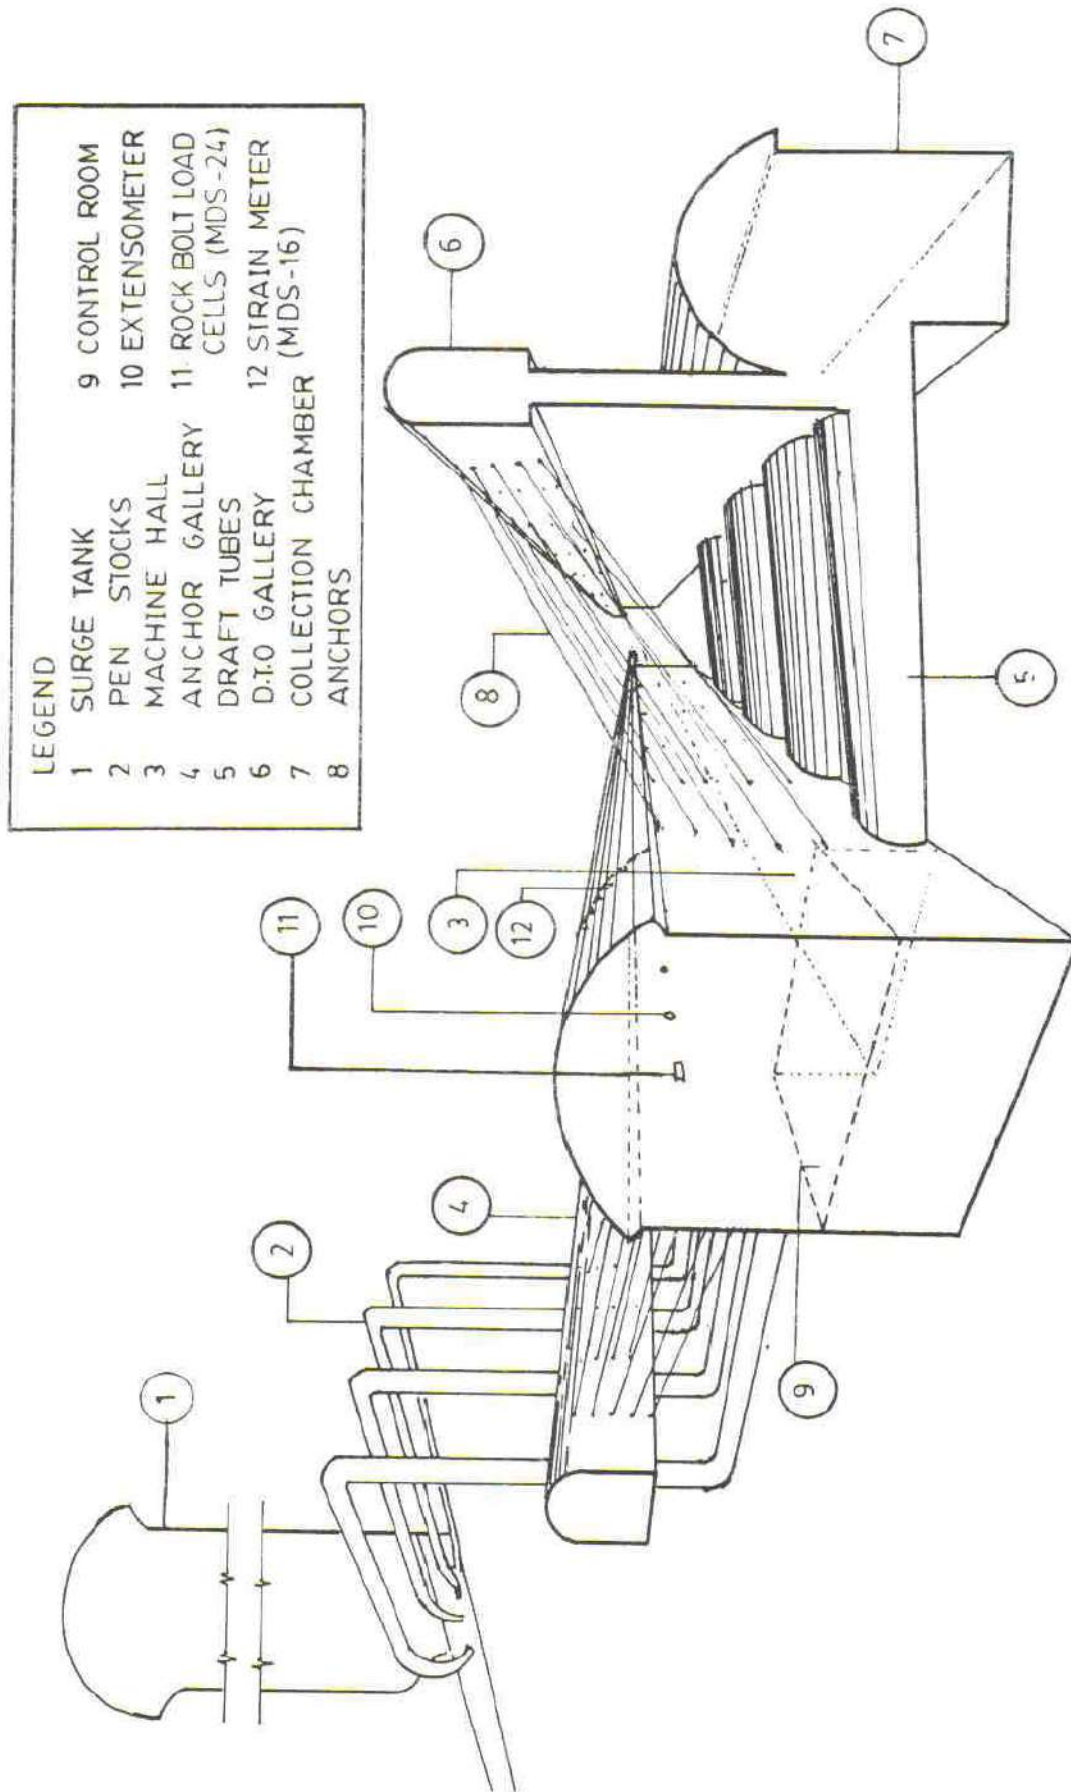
CROSS SECTION AND PLAN OF THE UNDERGROUND POWER HOUSE COMPLEX WITH INSTRUMENTATION LAYOUT
